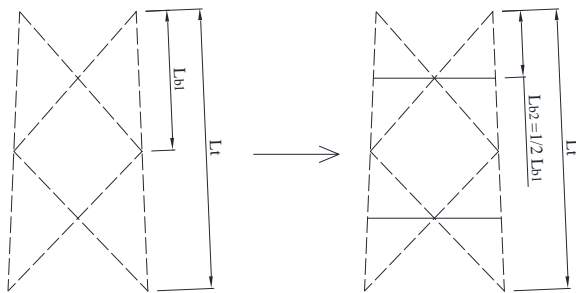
Changing the static scheme of a structure – shortening the buckling length of legs with an X-bracing system
